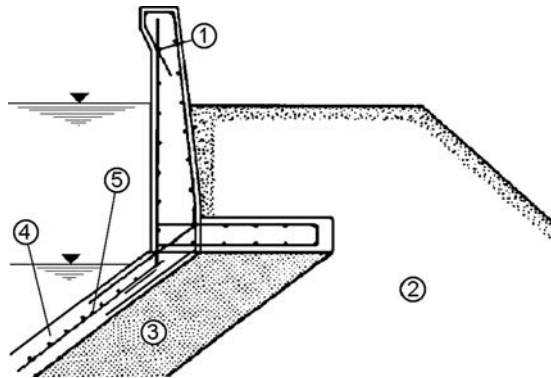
Parapet wall at the upper end of facing. (1) Parapet wall; (2) dam embankment; (3) sub-facing layer; (4) slabs of the facing; (5) reinforcement.
